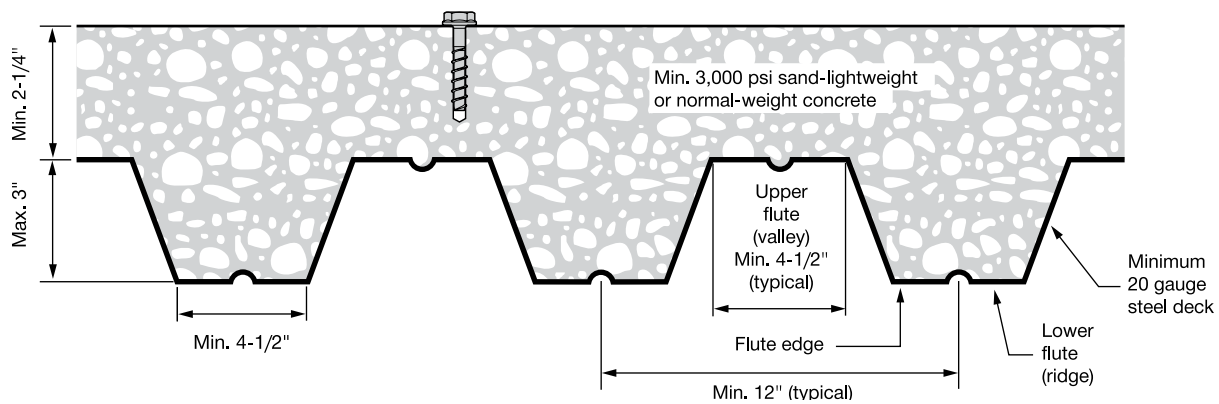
Installation of KWIK HUS-EZ (KH-EZ) in soffit of concrete over steel deck floor and roof assemblies¹
